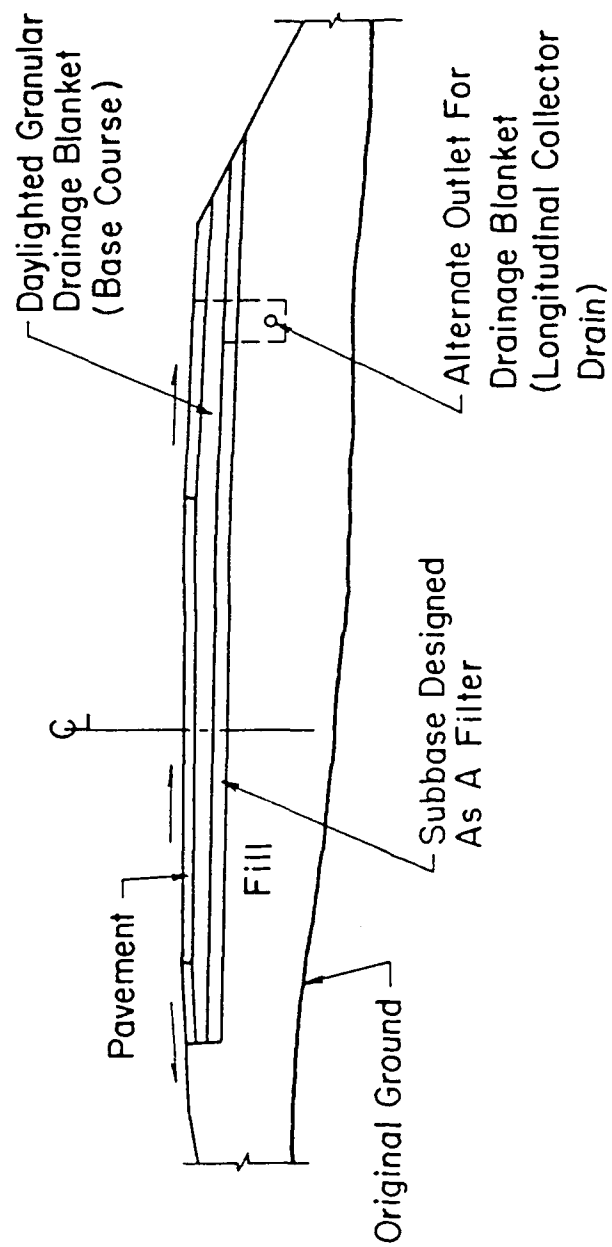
Example of a Pavement Subbase Drainage Blanket (Ref. 1).
